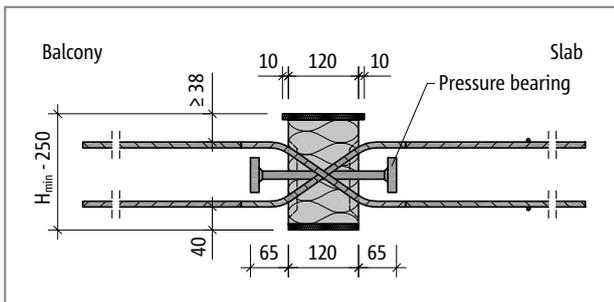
Schöck Isokorb® XT type Q-P-VV1: Product section
